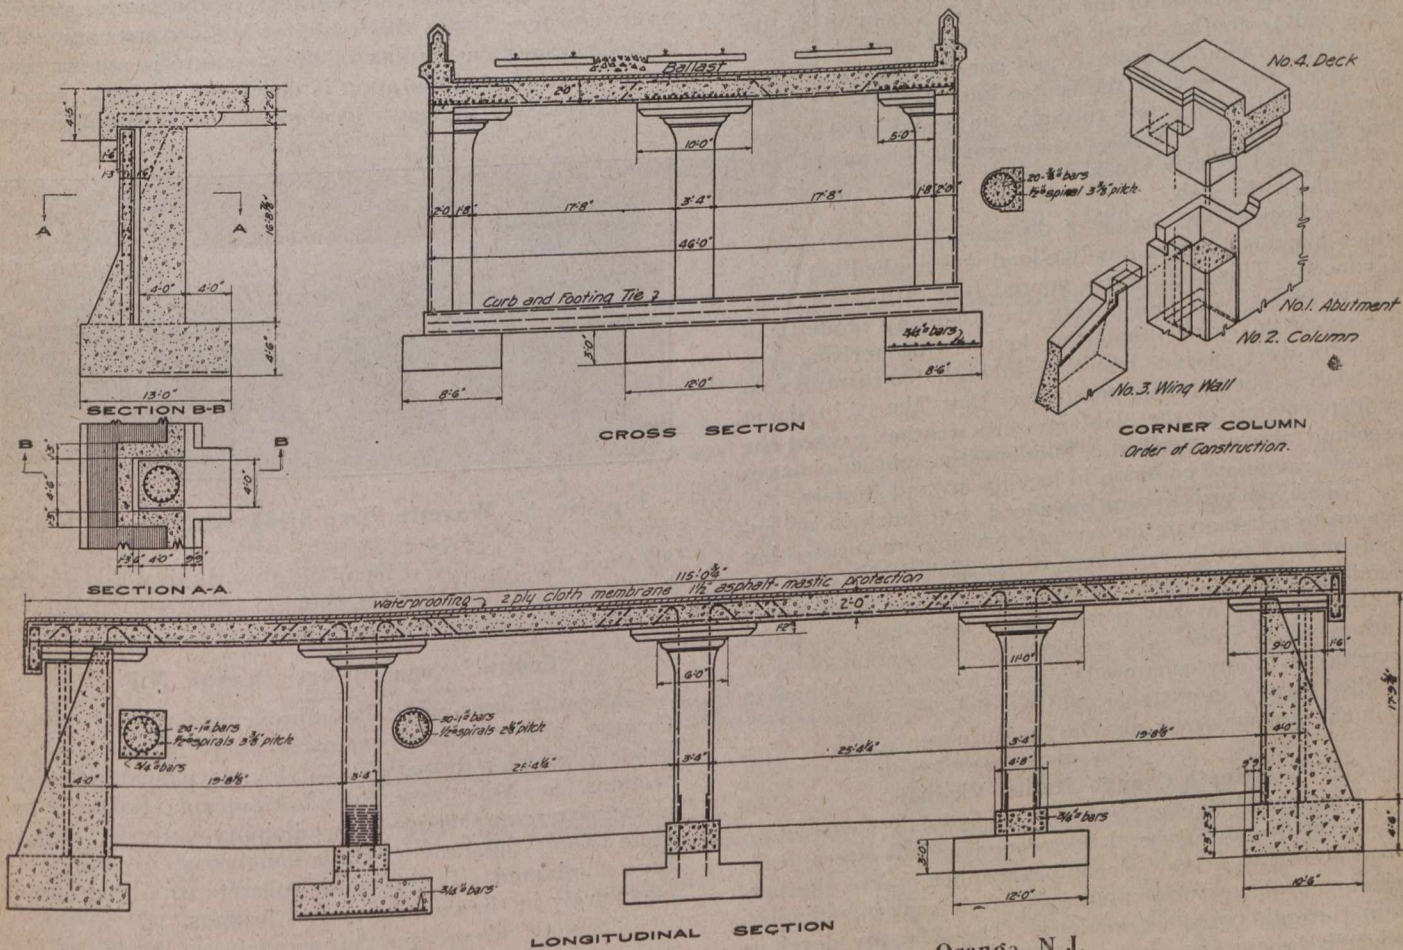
Details of Bridge at Central Avenue, Orange, N.J.
